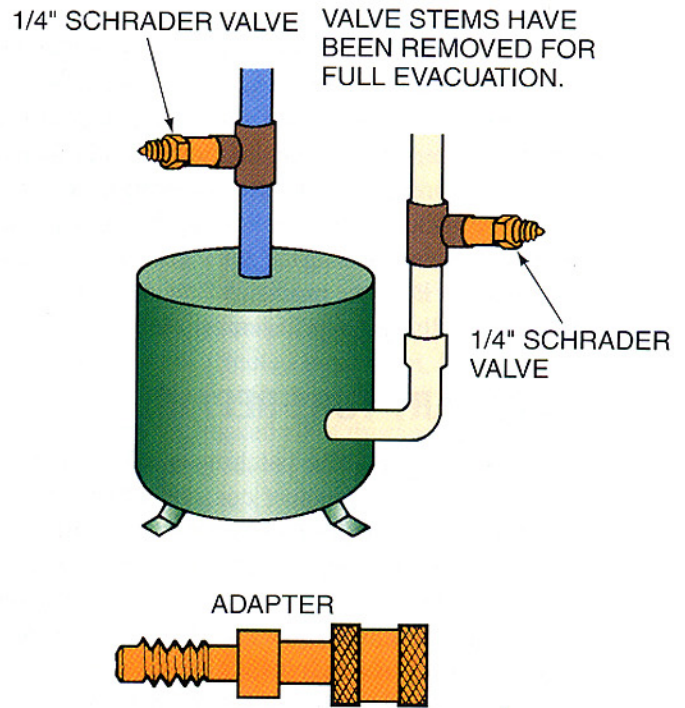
Full-size gage connections must be installed to remove moisture. *Photo by Bill Johnson
